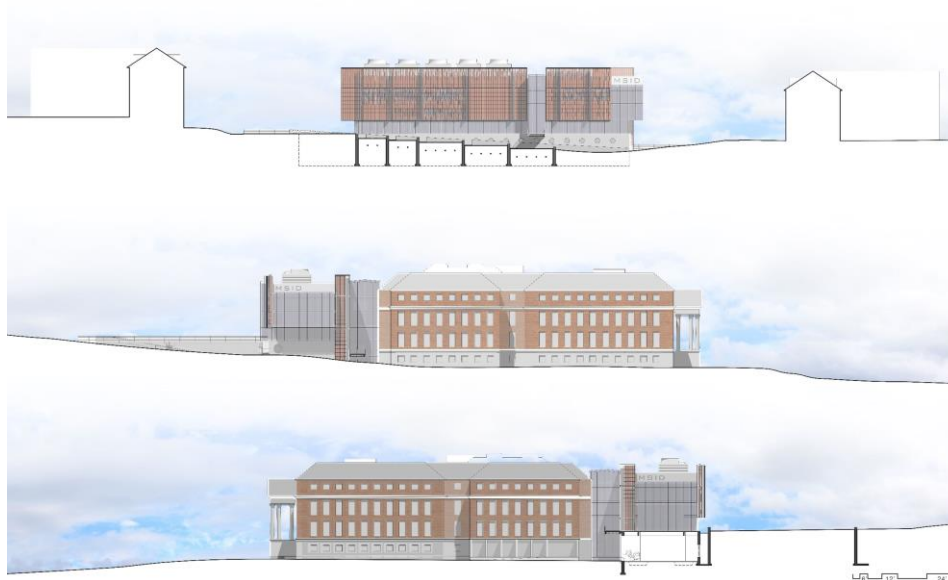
from top to bottom: W elevation, S elevation, N elevation (Source: Greg Goldstein)
